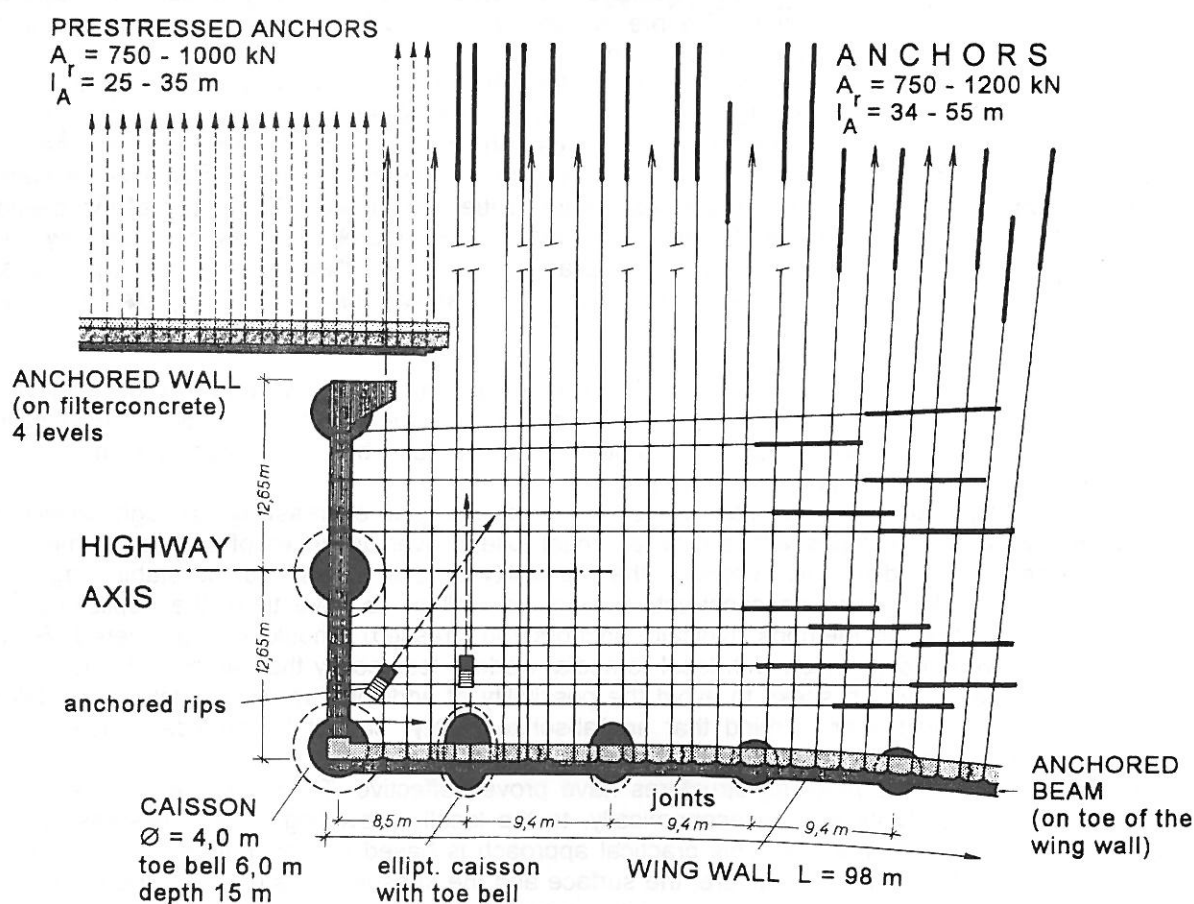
Ground plan of a highway bridge abutment in a steeply inclined unstable slope. Foundation on caissons and geotechnical anchoring in both directions. Retaining walls also intensively tied back with prestressed anchors. Only anchors of one of a total of four levels are indicated. $A_r = T_w$ = working load.
